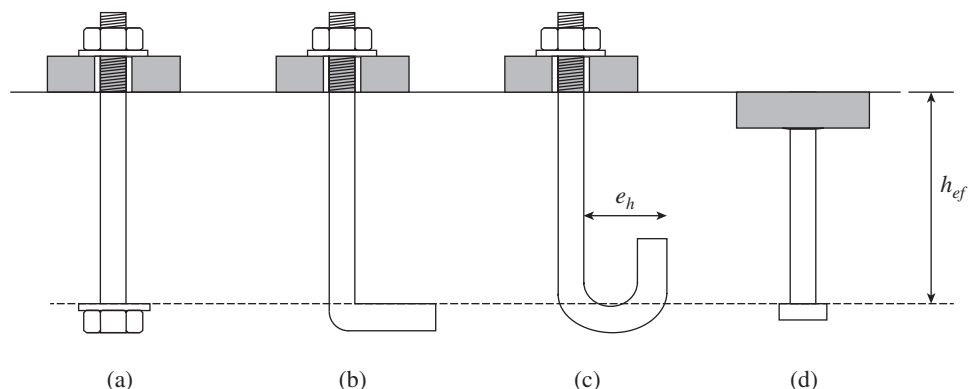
Cast-in-place anchors (a) Headed hexagonal bolt with washer (b) L-bolt (c) J-bolt (d) Welded headed stud
